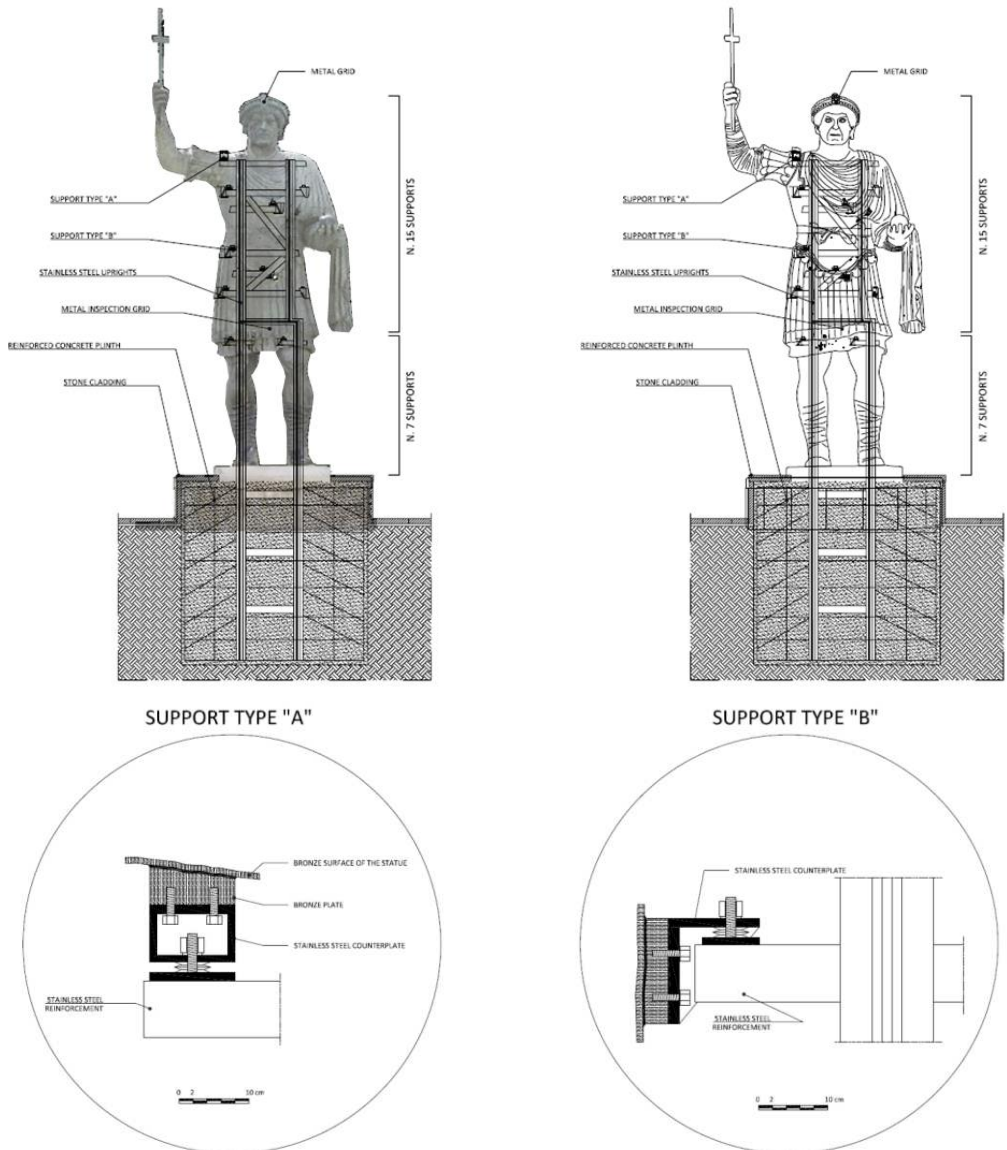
Construction details of the internal steel reinforcement structure and structural nodes.
